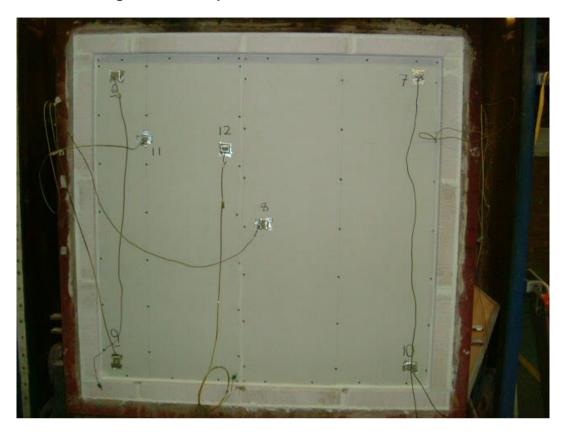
Test Specimen 2 - Pre-test - Non Fire Side
